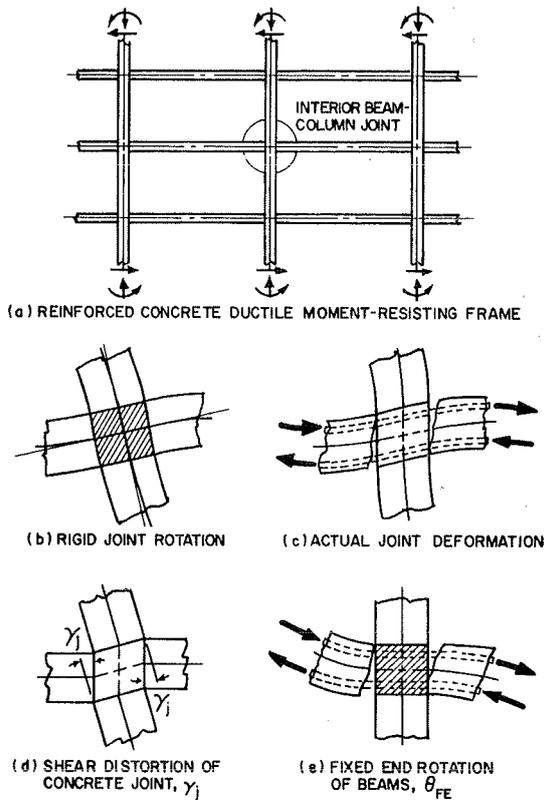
SOURCES OF DEFORMATION IN AN INTERIOR BEAM-COLUMN JOINT OF A DUCTILE MOMENT-RESISTING FRAME
